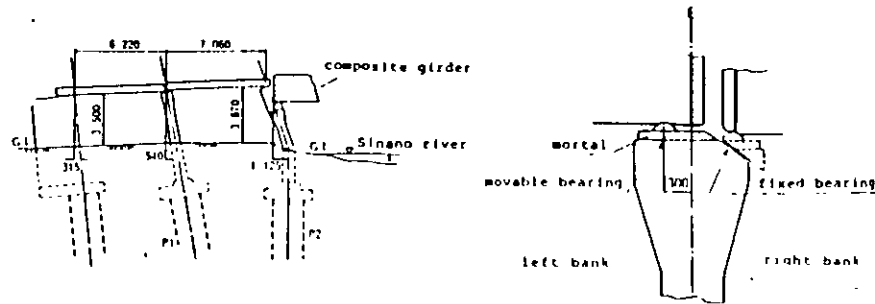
Damage to P₁ and P₂ of Yachiyo Bridge due to 1964 Niigata Earthquake
